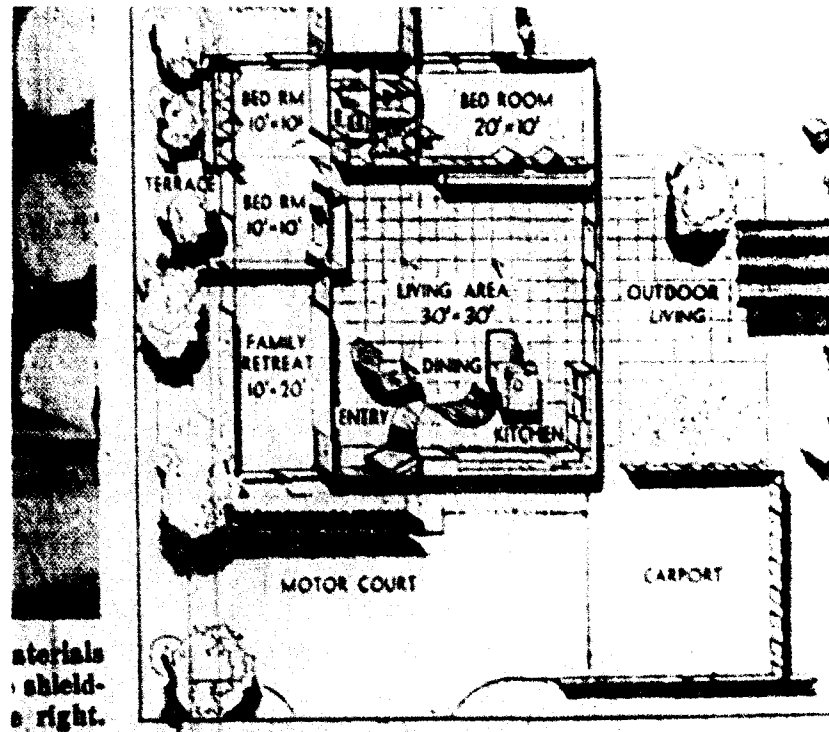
Floor plan from 1960 showing a living room and a separate room for use of the household. *Note.* From “Beauty and Permanence to Home Construction,” 1960, January 24, *New York Times*, section 8, p. 1.
